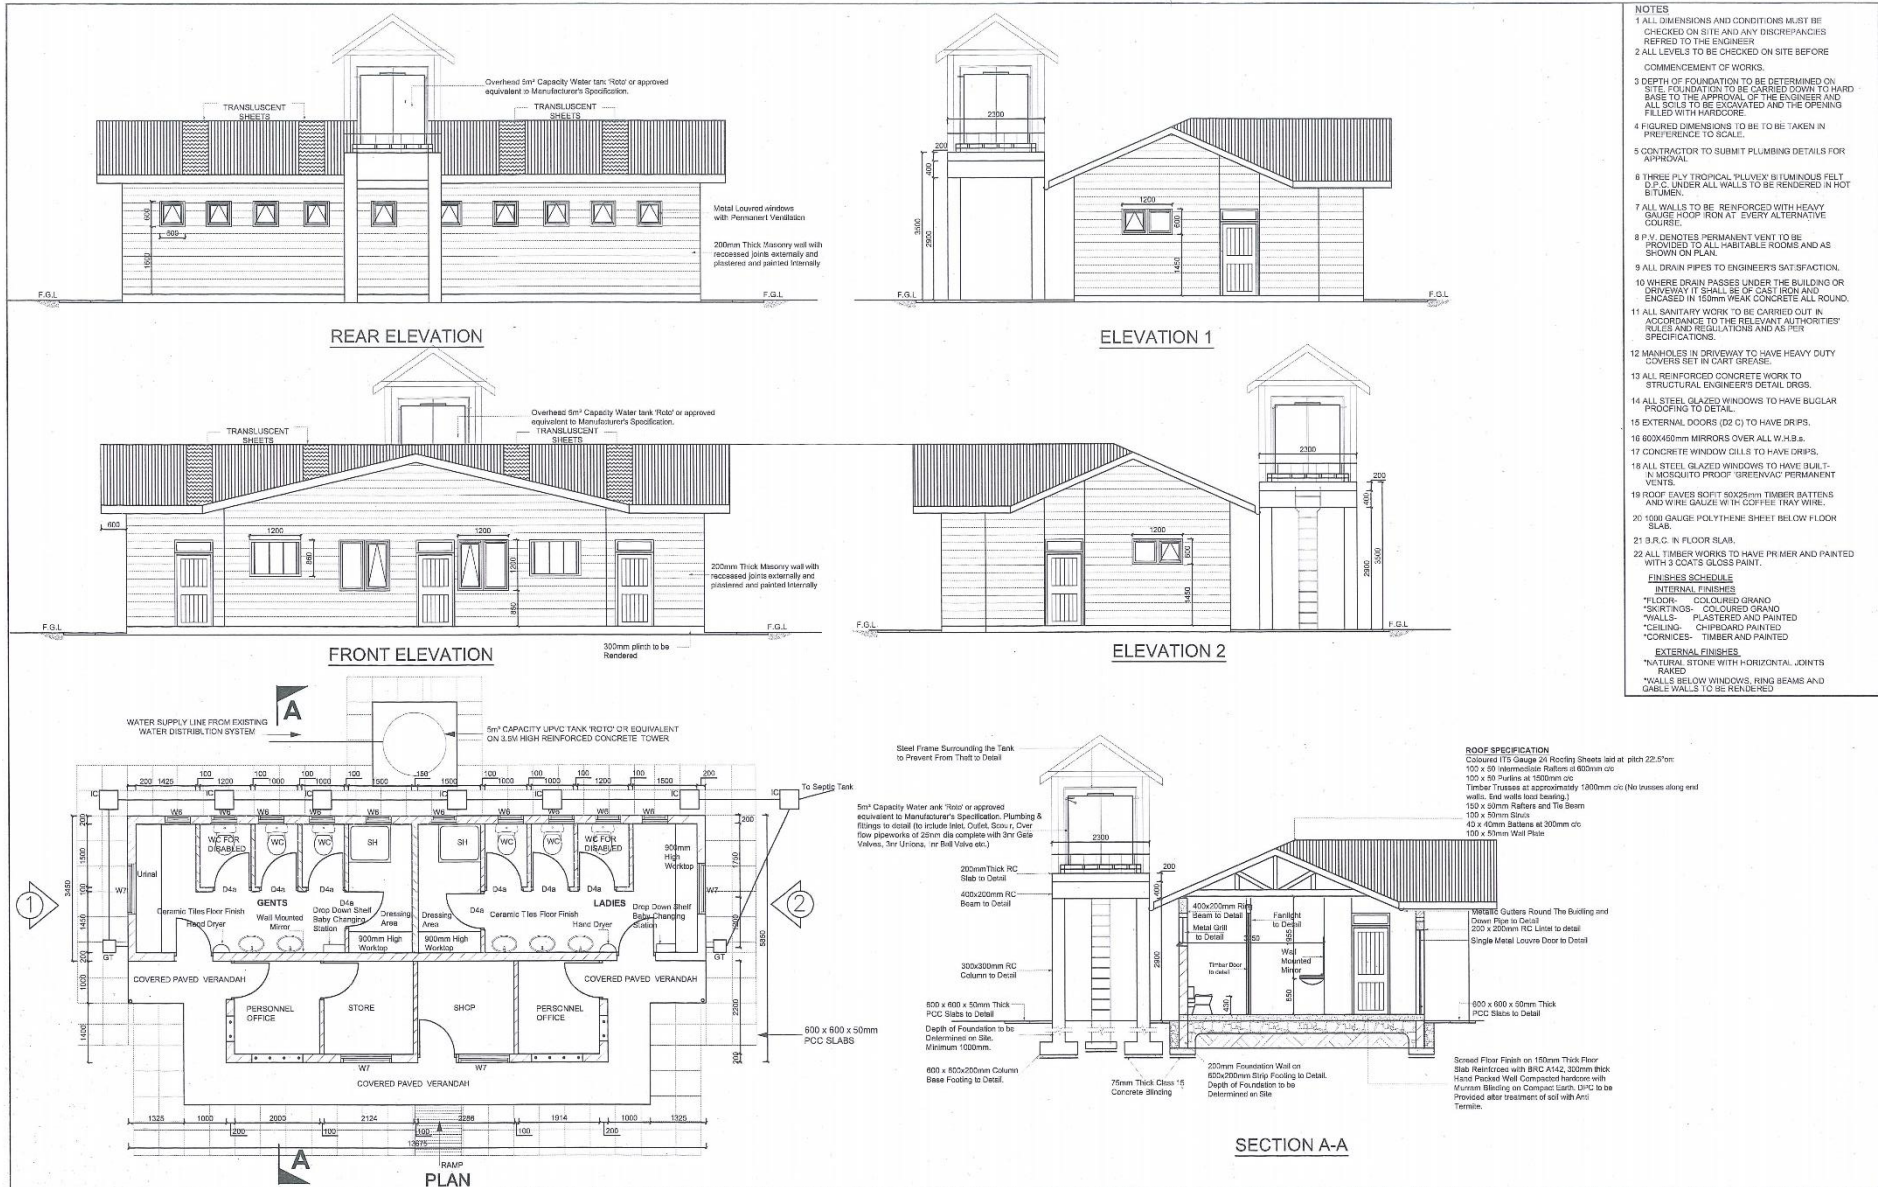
Typical Plan, Views and Sections of an Ablution Block
